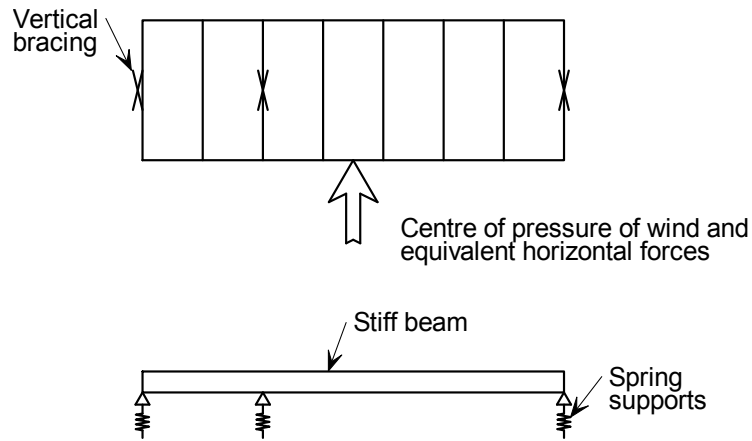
Unsatisfactory bracing arrangement if disproportionate collapse is to be avoided
